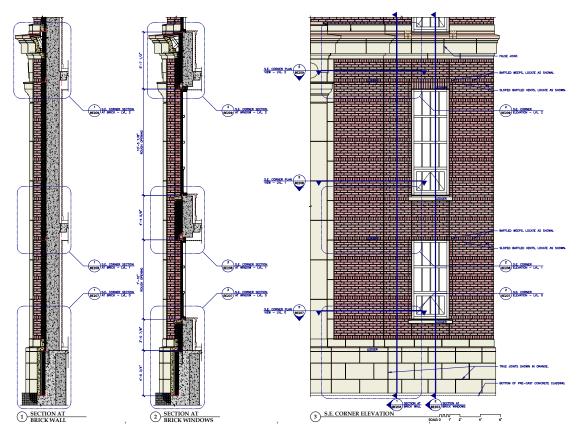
N-S Section of Ext. Walls @ New Brick Veneer Cladding, Ground & 1st Floor
